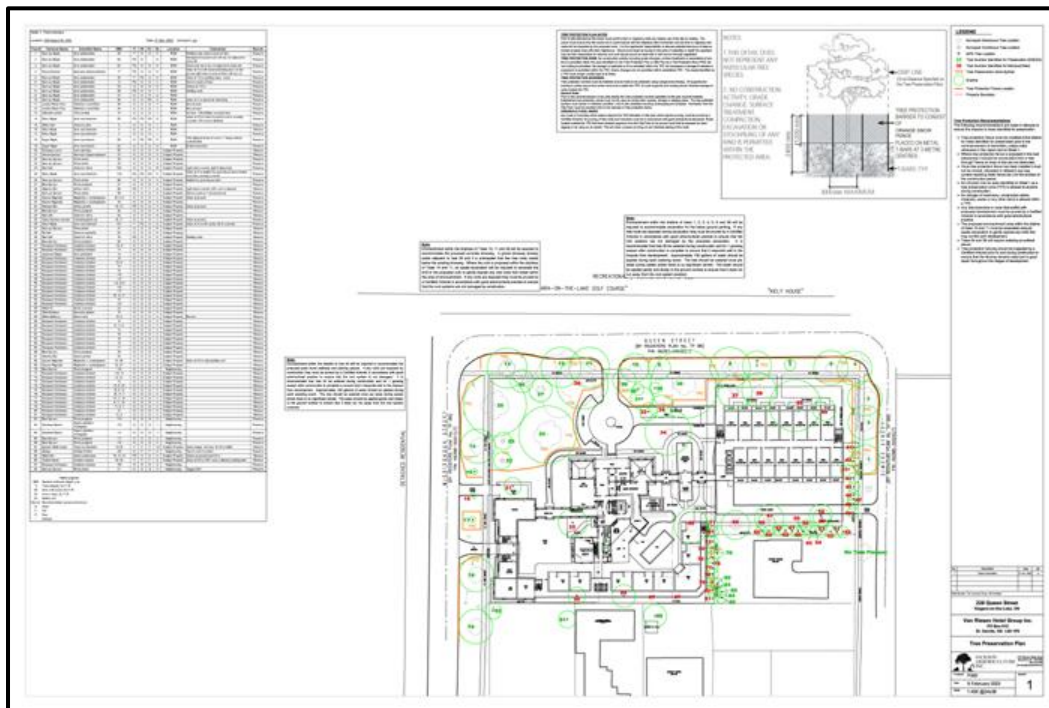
Tree Protection Plan Diagram, APPENDIX IV
